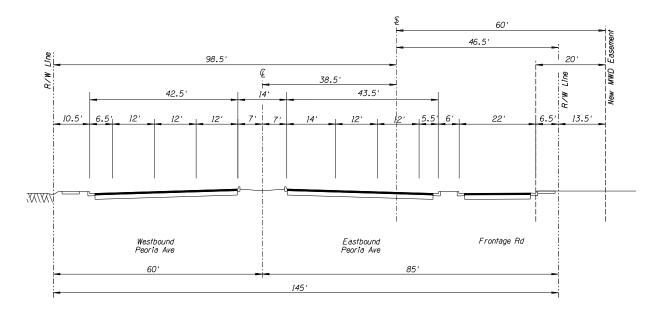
Narrow Hybrid with Frontage Road Typical Section
